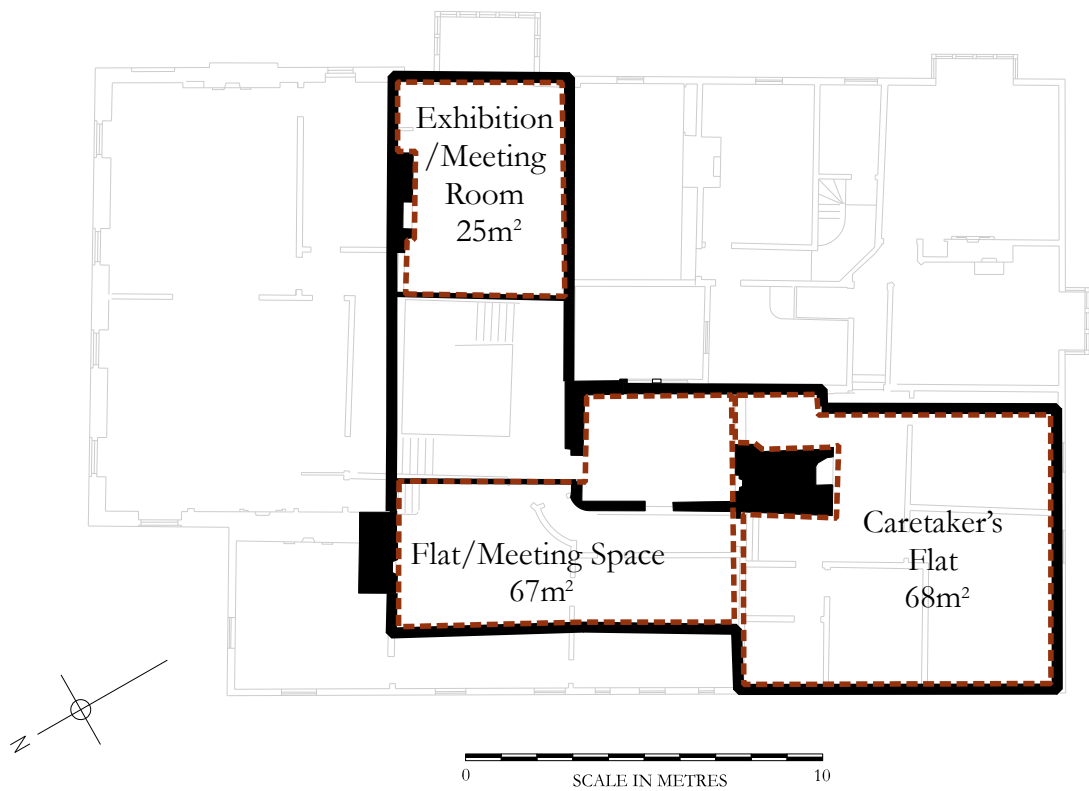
Potential use of reduced building as café, meeting rooms and flat
